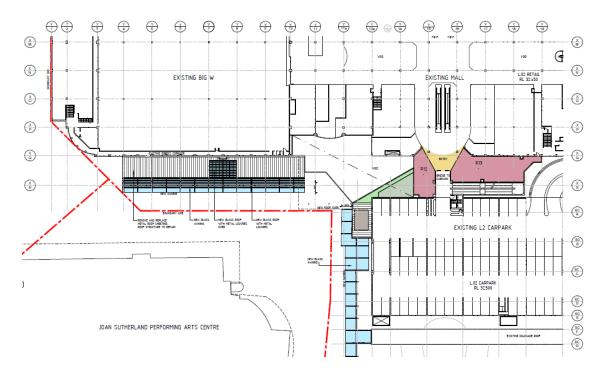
Part Level 2 plan showing the proposed new tenancy areas and awning over the path of travel to High Street
